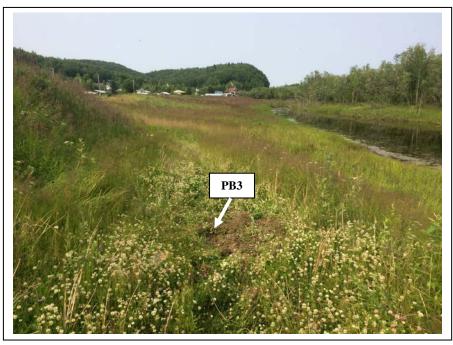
Looking north at the location of Hand Boring PB3. (July 12, 2017)
